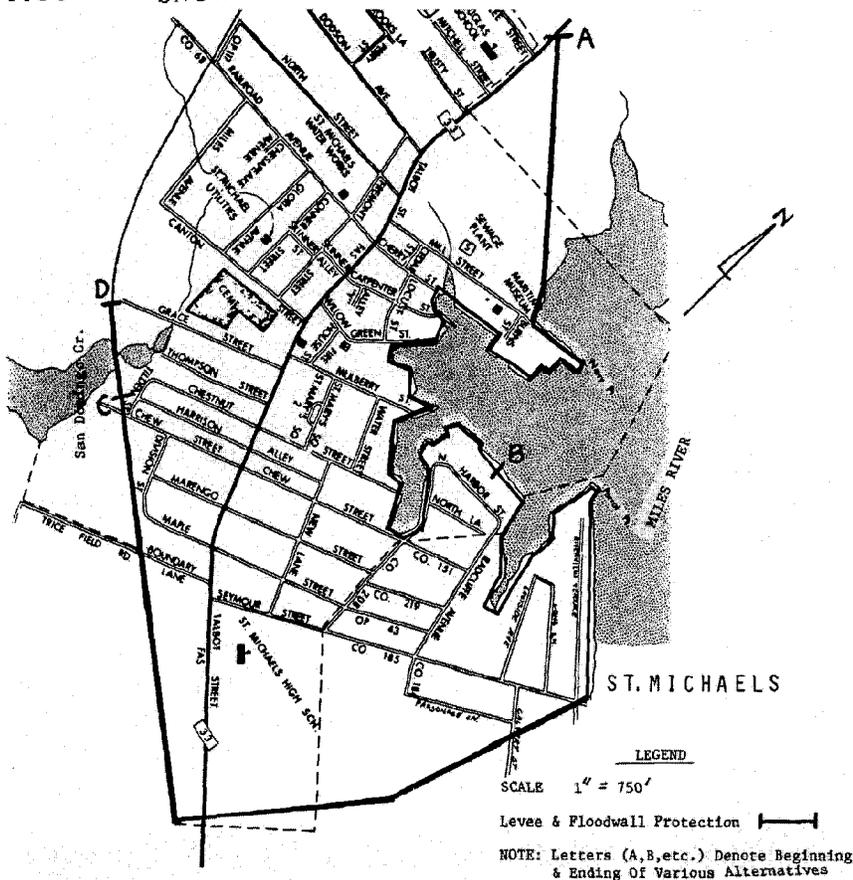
ST. MICHAELS PLANS OF IMPROVEMENT
